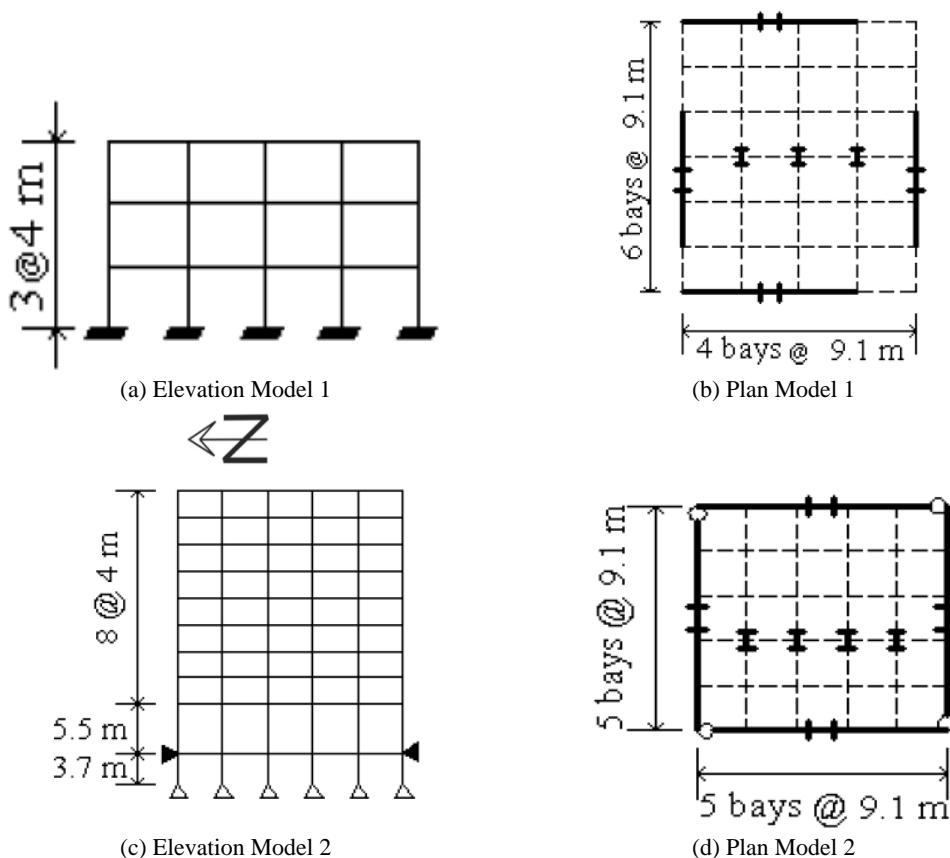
Elevations and plans for SAC1 and SAC2 Models
